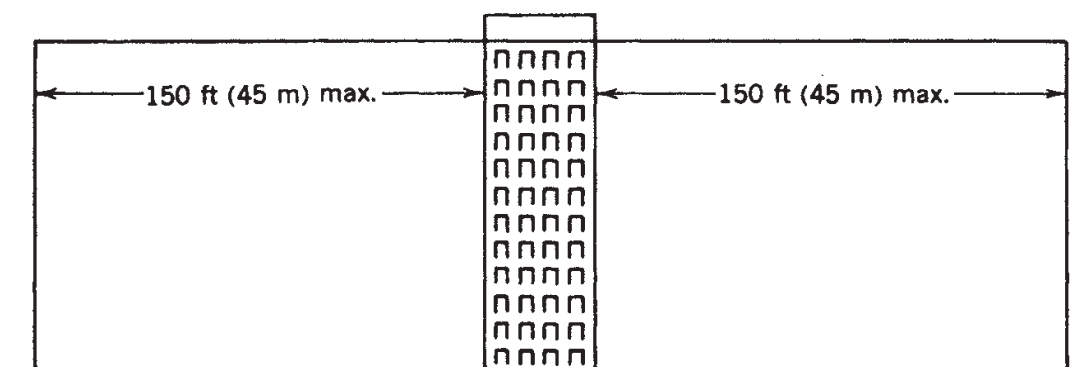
The maximum distance people have to walk to an elevator on any floor (Strakosch and Caporale, 2010).
